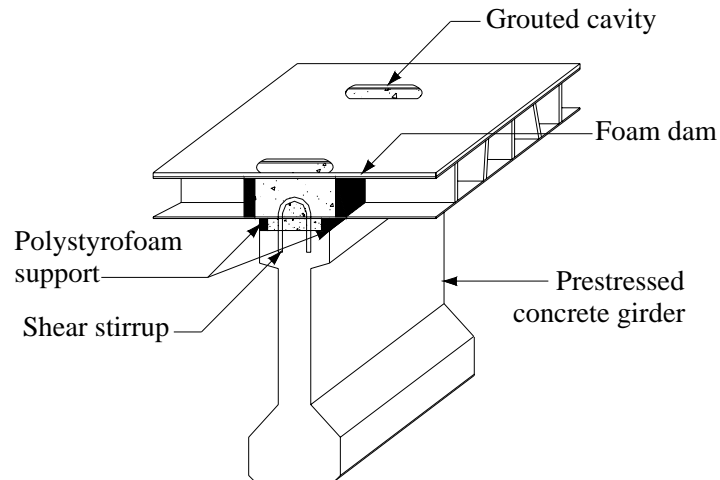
Composite Action: FRP Panel and Prestressed Concrete Girder
